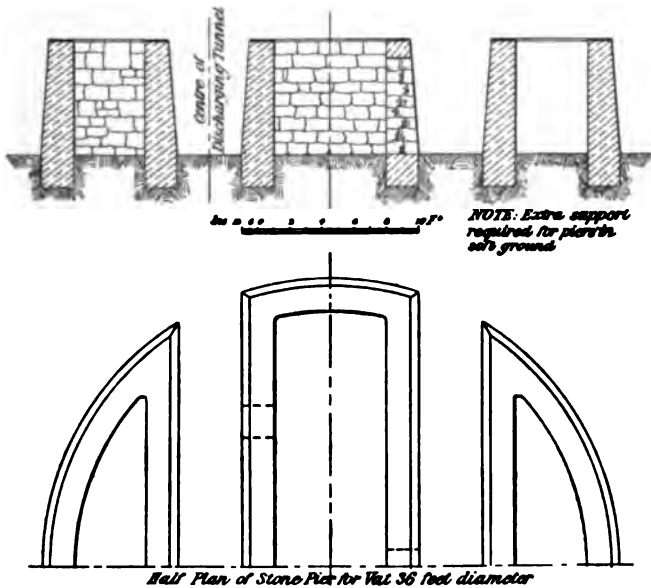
Half Elevation at End of Tunnel and Half Cross-section through Tunnel.
